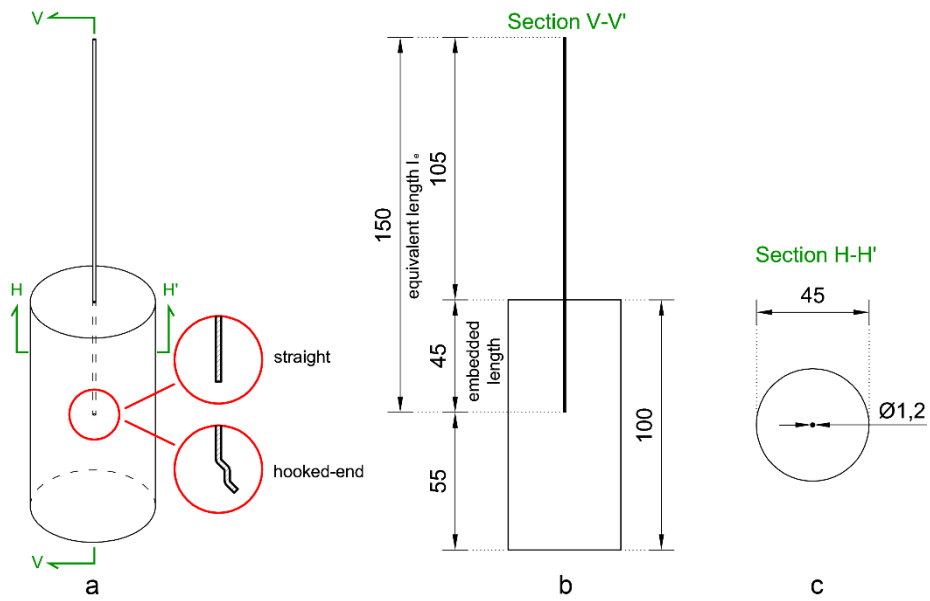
Geometrical details of the specimens for the single fibre pull-out test: a) perspective view; b) longitudinal cross-section (Section V-V'); and c) transversal cross-section (Section H-H')
